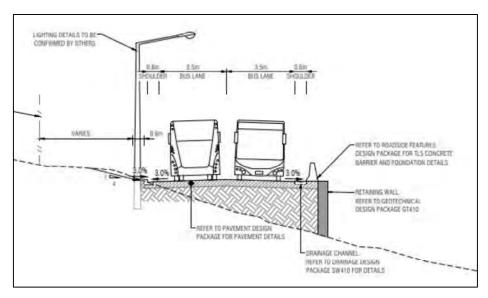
Typical Cross Section of EB4L Retaining and Fill
